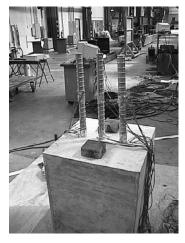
shows the footing and 16-in. square pile with a single-line arrangement of three epoxy coated #9 connectors (1/3). Two steel shim stacks are shown in place at the top of the pile in the longitudinal direction. Shims were 3 in. x 3 in. and 1.5 in. thick and consisted of three $\frac{1}{2}$ in. steel plates tack-welded together. Shims were placed 1-1/2 to 2 in. away from the edge of the pile and required slight adjustment to ensure a level bearing for the cap. Shims were not held down and did not move during cap placement.
